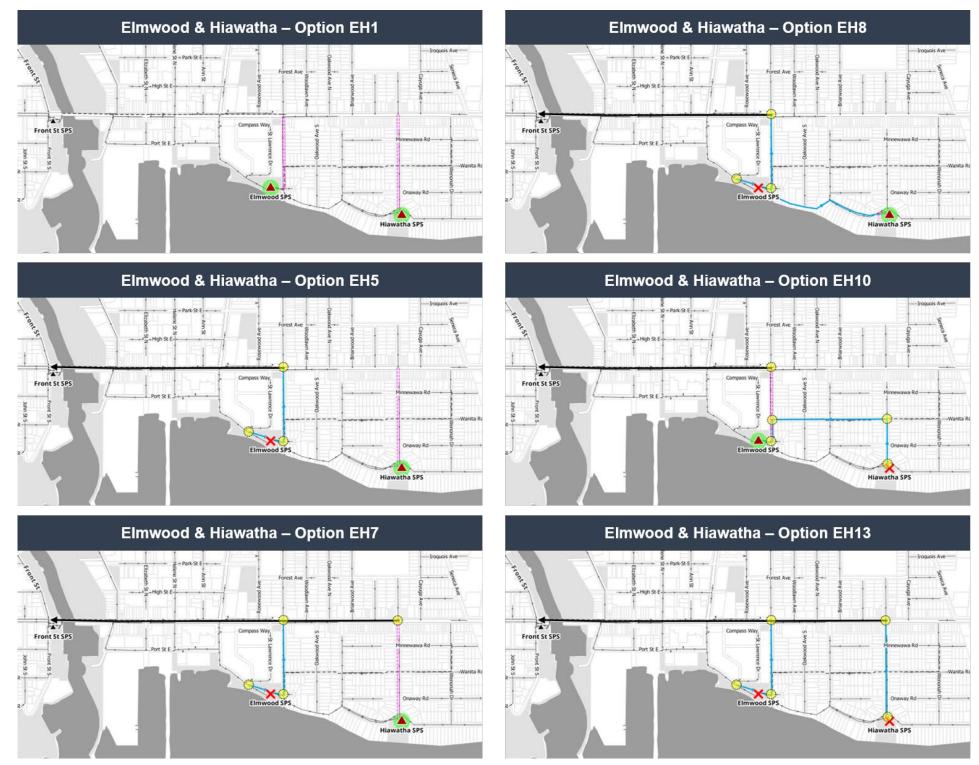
Elmwood and Hiawatha SPSs Short List Servicing Alignment Alternatives
